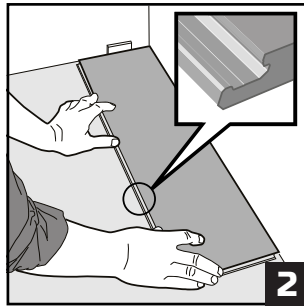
Now it's time to lay the first plank in the first row. Start in a left corner and lay a plank with the tongue side facing the wall. Now insert a wedge between the wall and the plank's left short side so there is a gap at least 1/2" (8-10mm) wide.
